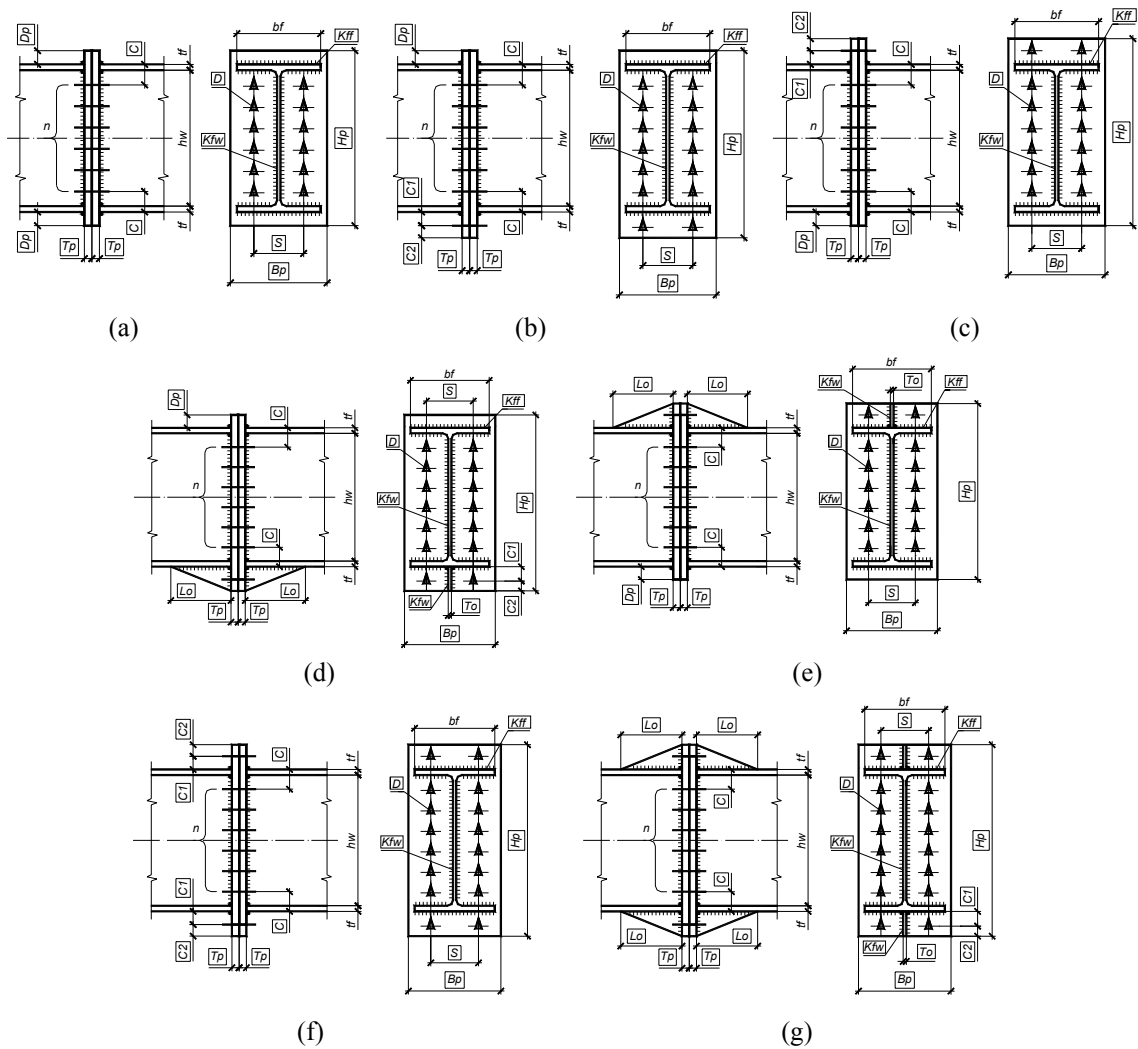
Structural designs of the Beam-To-Beam joints with end-plate
